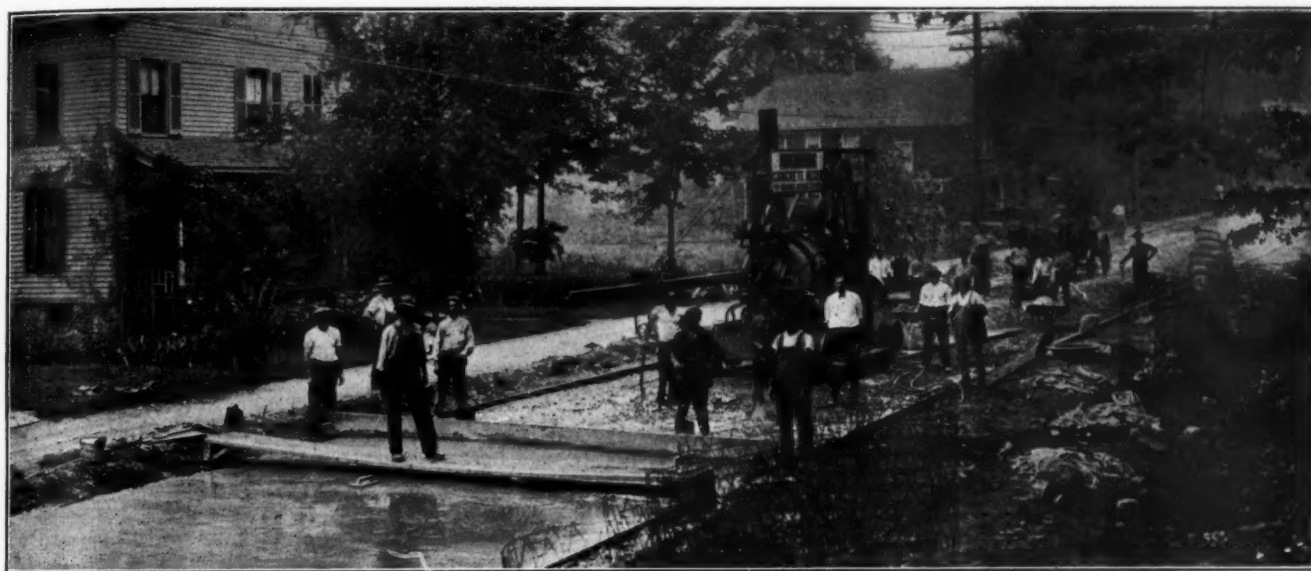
MUNICIPAL FORCE OF NORWALK, CONN., BUILDING CONCRETE ROAD.
